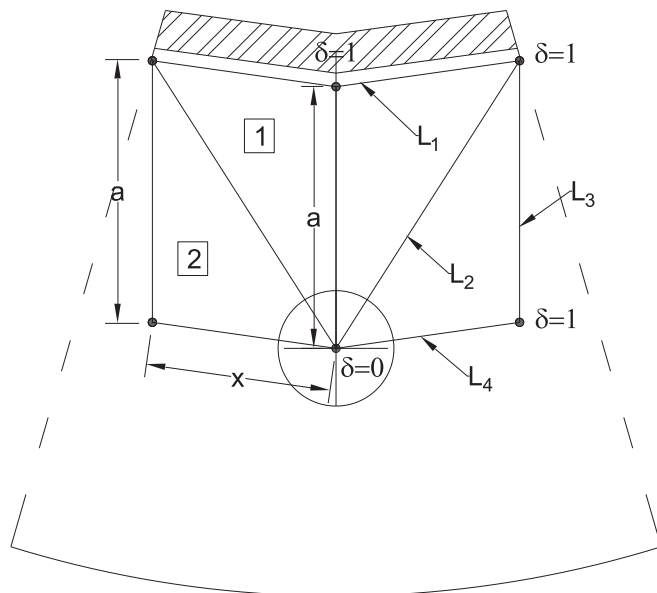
Zone Yielding Mechanism Subjected to Axial Load.
